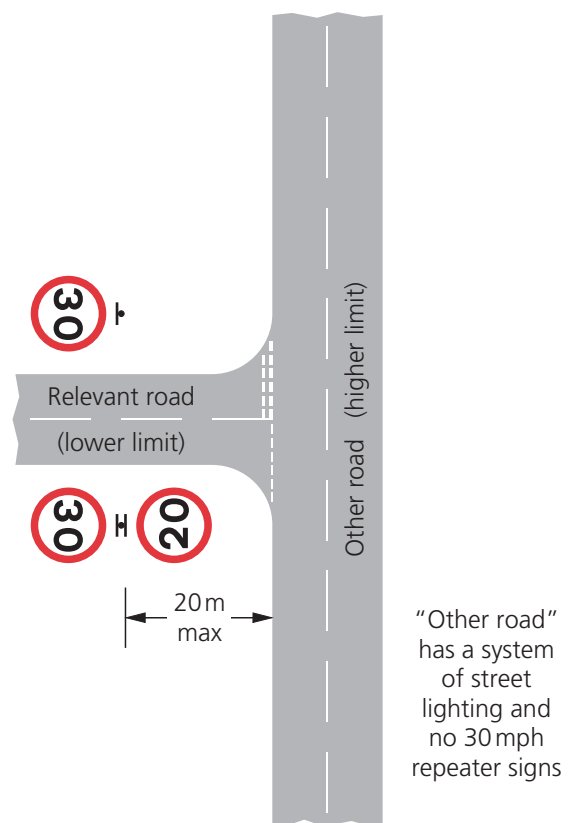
Terminal signs at a road junction where the side road (relevant road) has a lower speed limit than the major road
